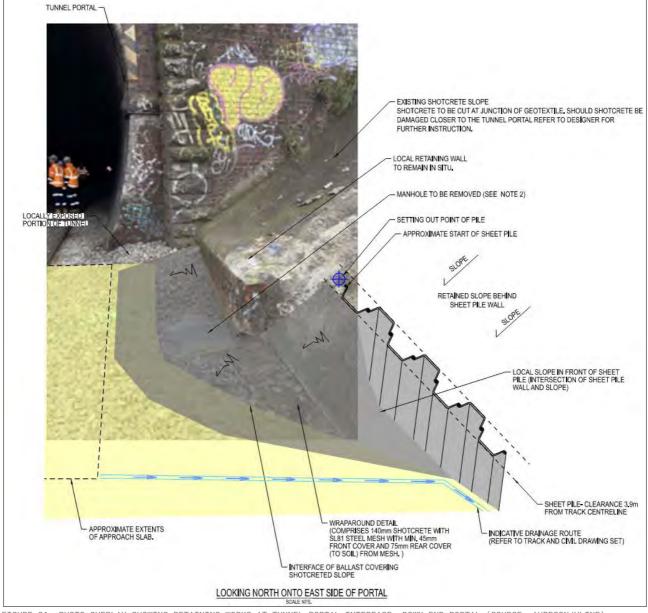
PHOTO OVERLAY SHOWING RETAINING WORKS AT TUNNEL PORTAL INTERFACE, DOWN-END PORTAL (SOURCE: AURECON/VLINE)
